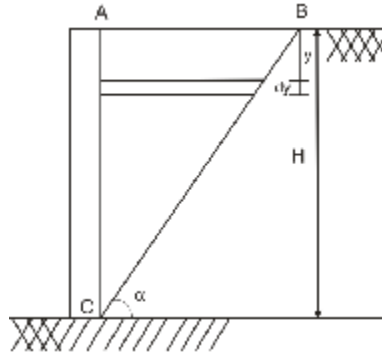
Soil Failed Wedge and Element of Soil Backfill
